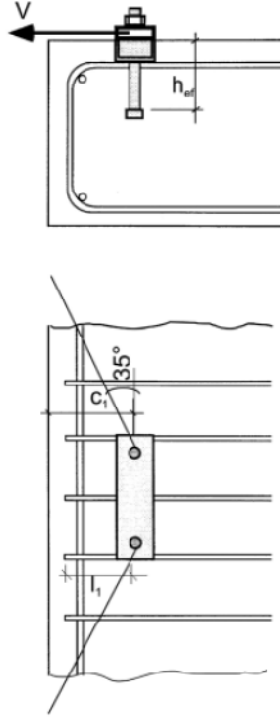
Breakout failure in cast in channel close to the edge. [7]
